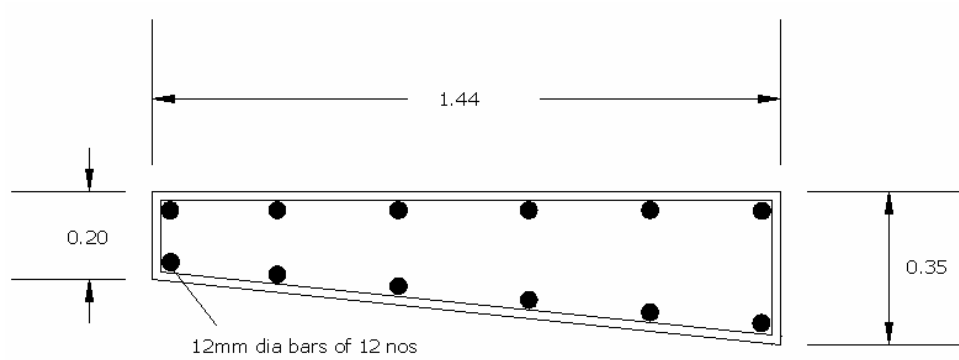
REINFORCEMENT DETAILS OF SIDE WALL OF ABUTMENT WALL
